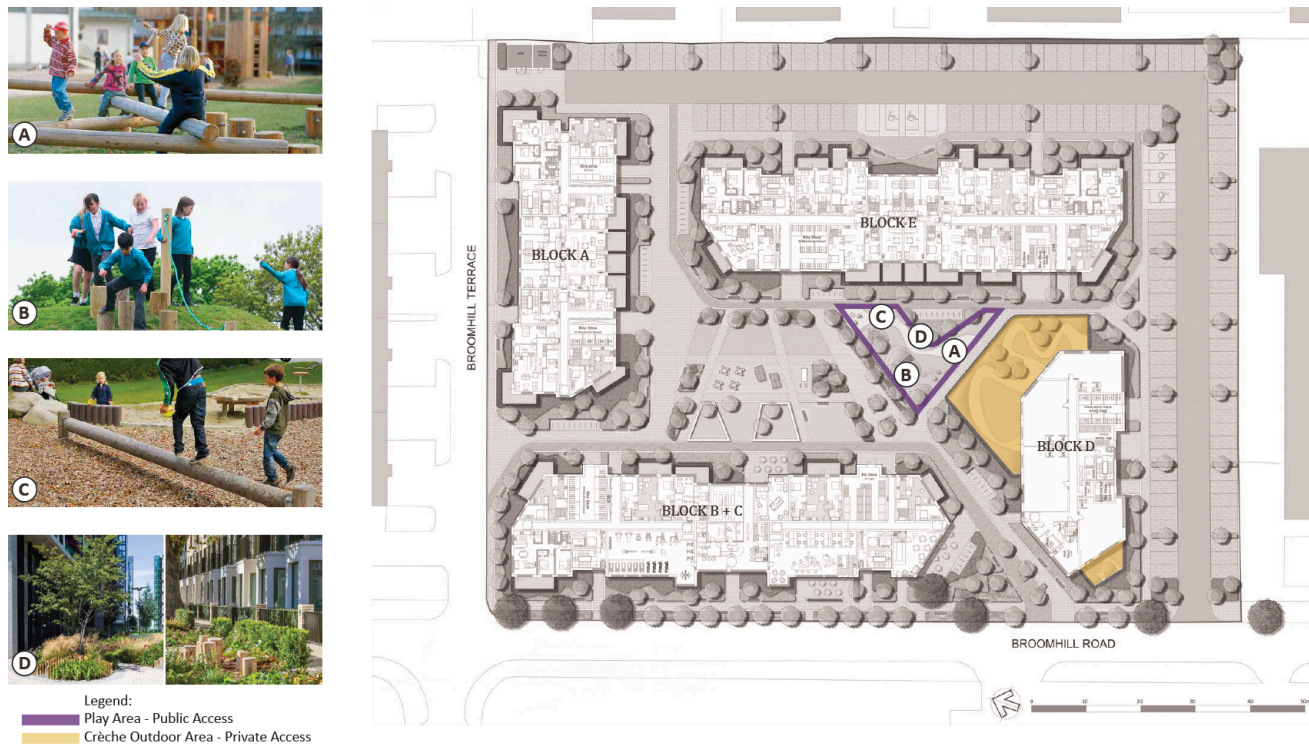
Proposed Landscape Masterplan indicating play areas [Source: Extracted from Parkhood Landscape Plan]
